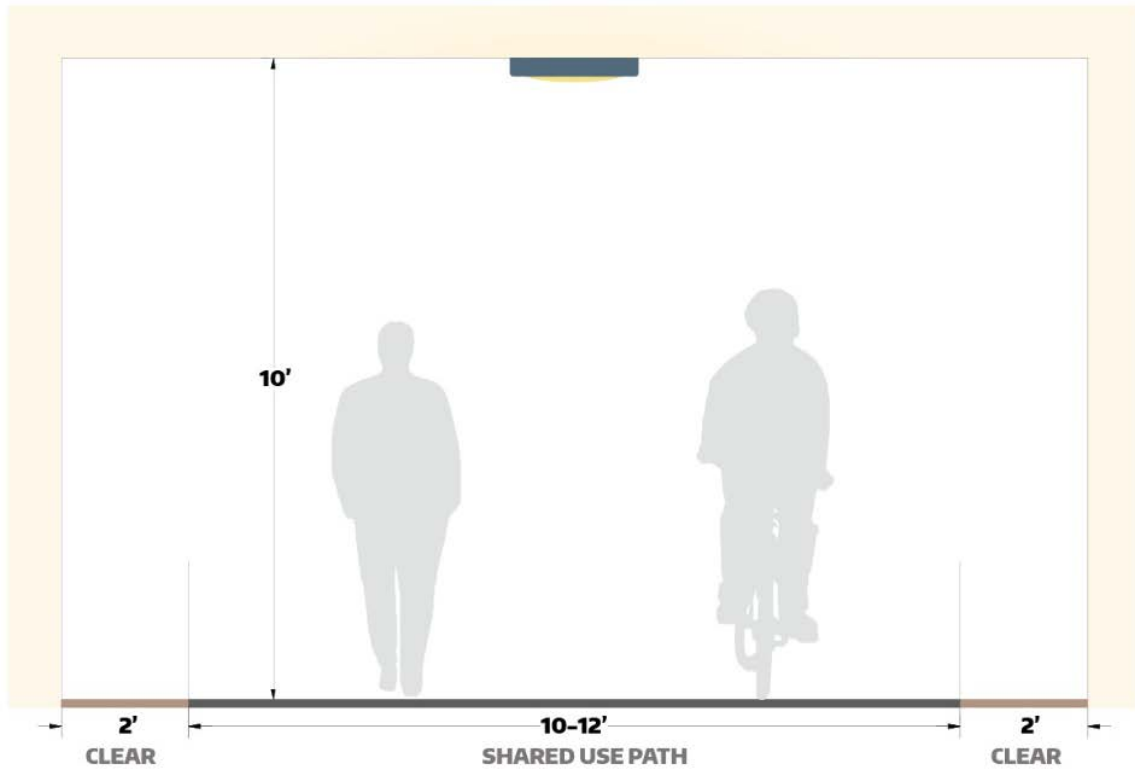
Typical Overpass / Bridge / Creek Crossing Configuration
